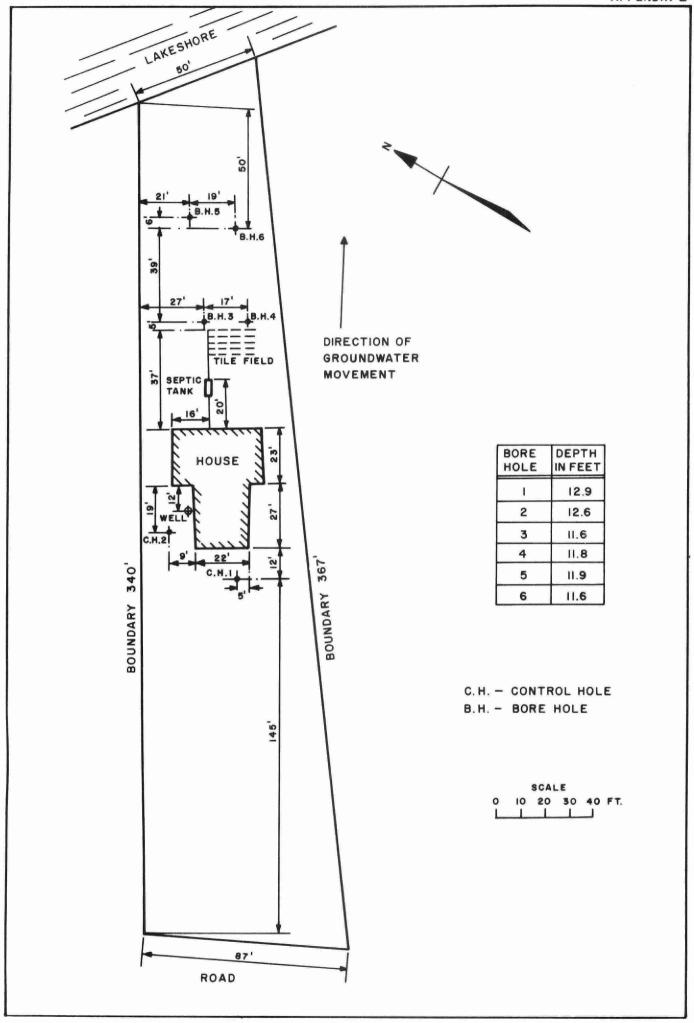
TRACER STUDY SITE PLAN EST. 0-3 LAKE COUCHICHING
